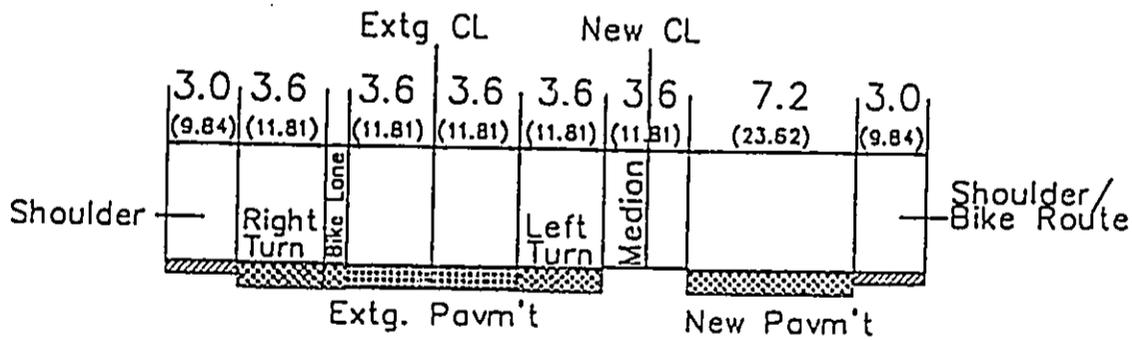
TYPICAL 4 LANE ROAD SECTION (Between Henry Street and Honokohau Harbor)
